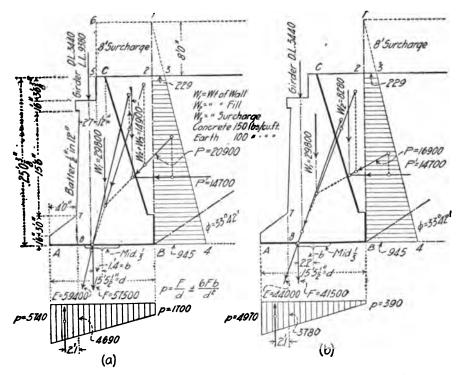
ABUTMENT FOR WEST ALAMEDA AVENUE SUBWAY, DENVER, COLO.
